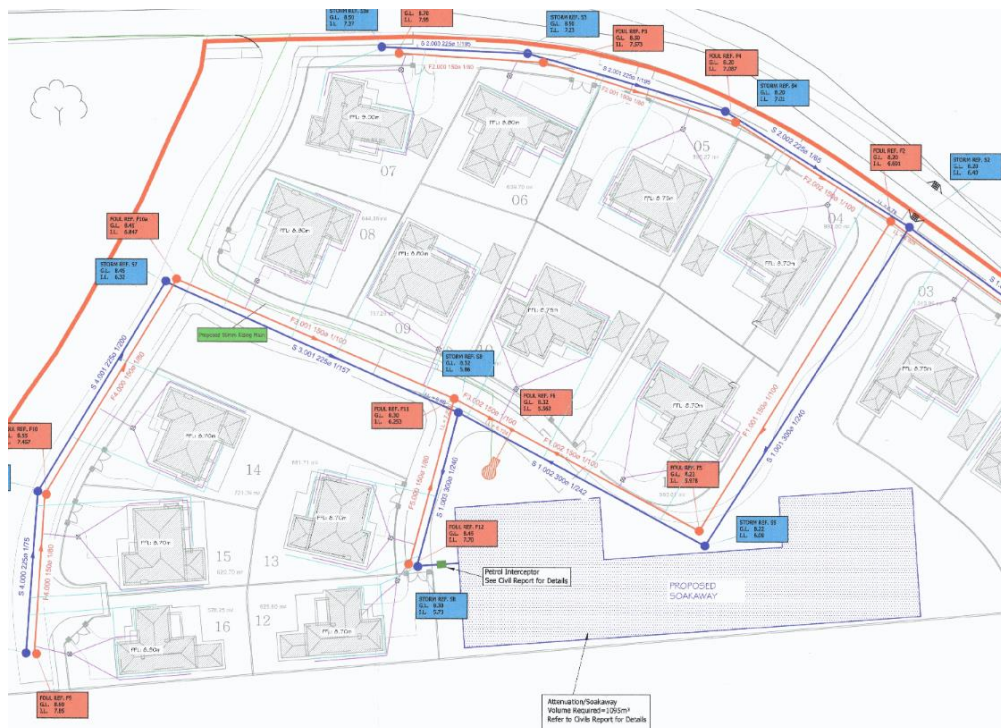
Layout plan of houses to the south of Dublin Road nearby Roshill Park Woods.
